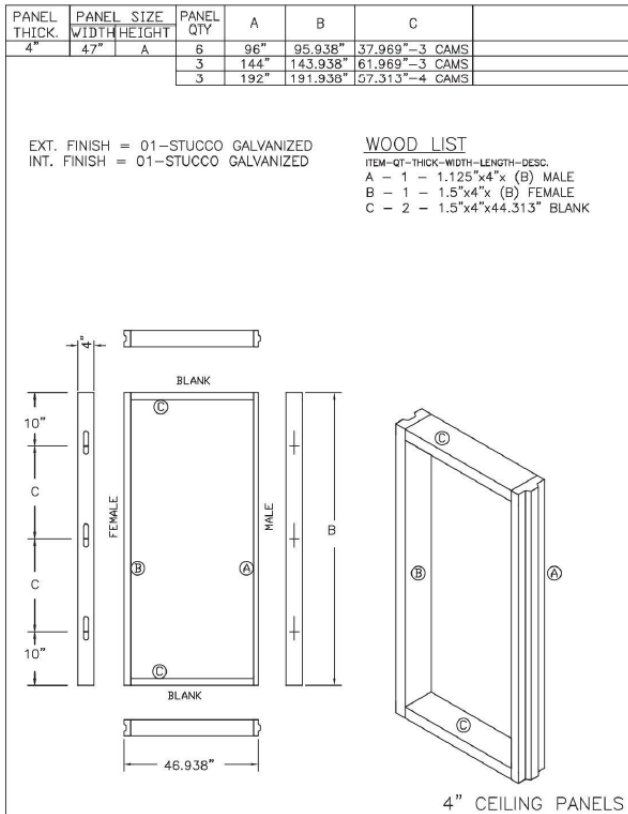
WOOD RAIL ROOF AND FLOOR PANELS
